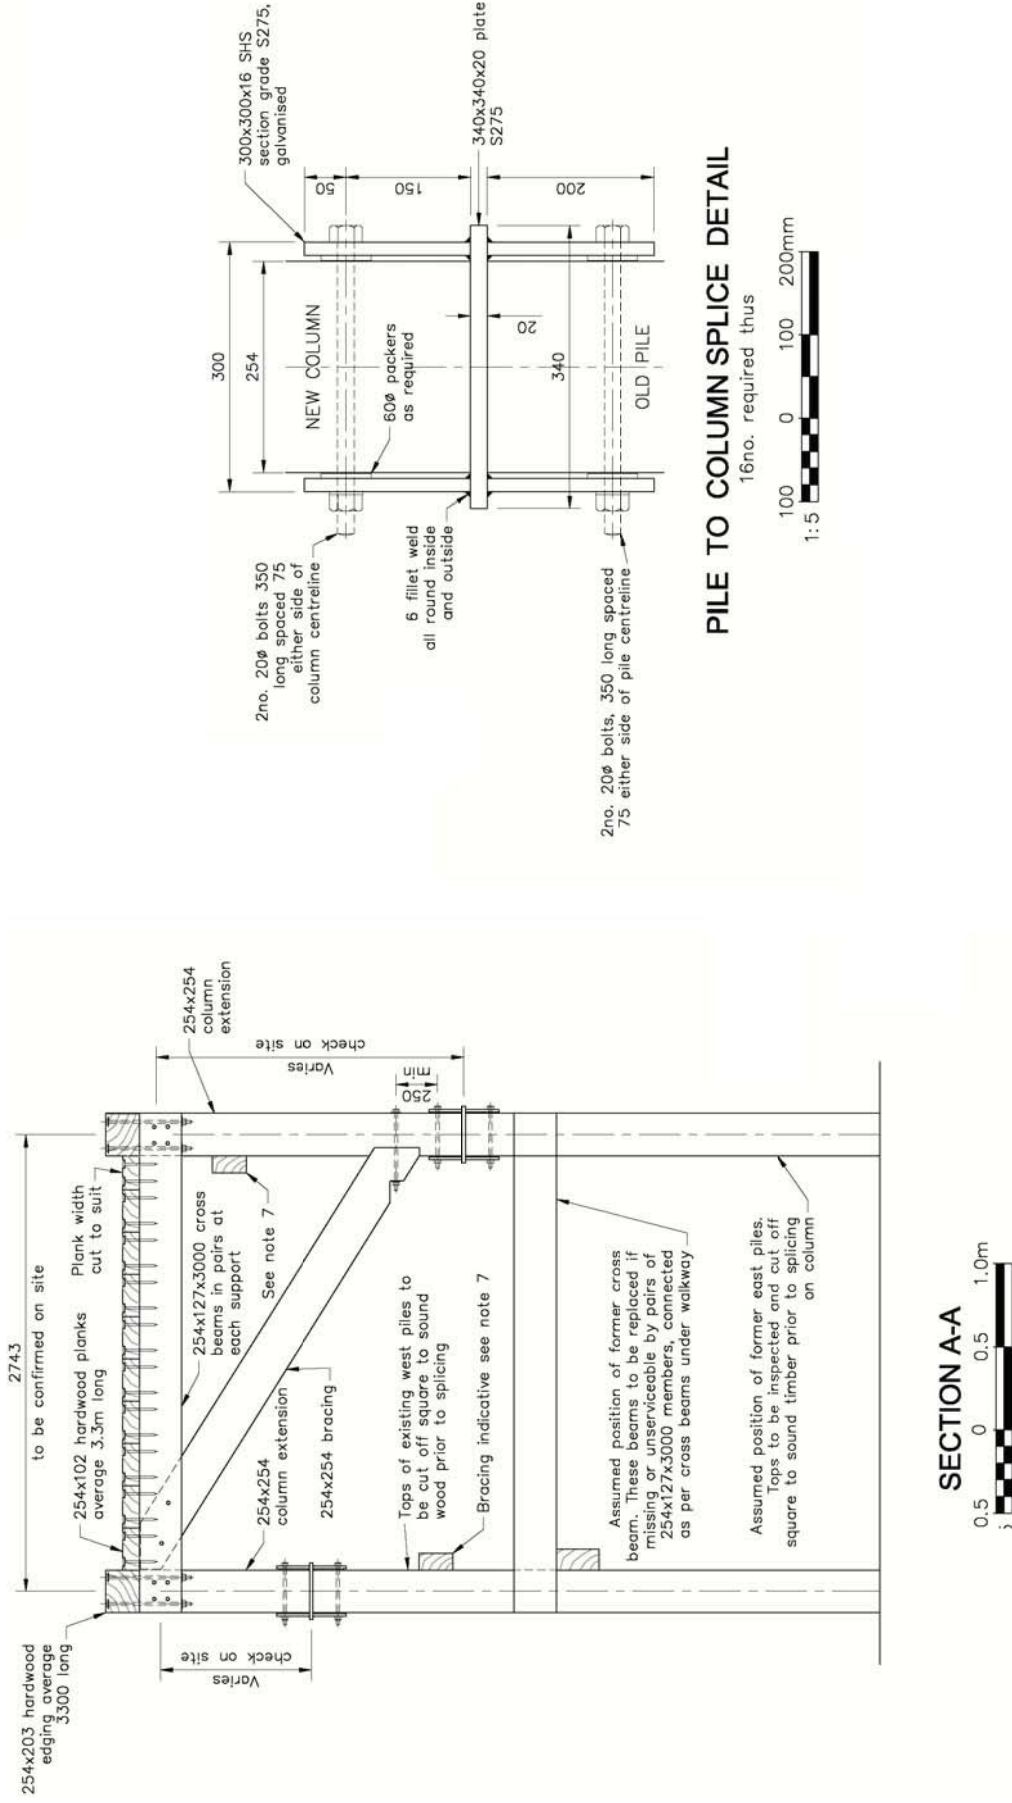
Sections showing intended reuse of assumed extant piles (from WNCAAX-091-16) (Appendix 1).
